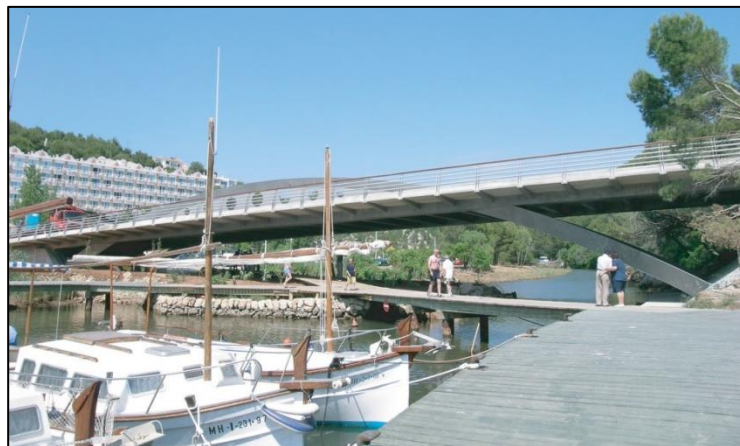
Cala Galdana Bridge in Menorca, Spain. The structure consists of two arches which support the reinforced concrete deck.
